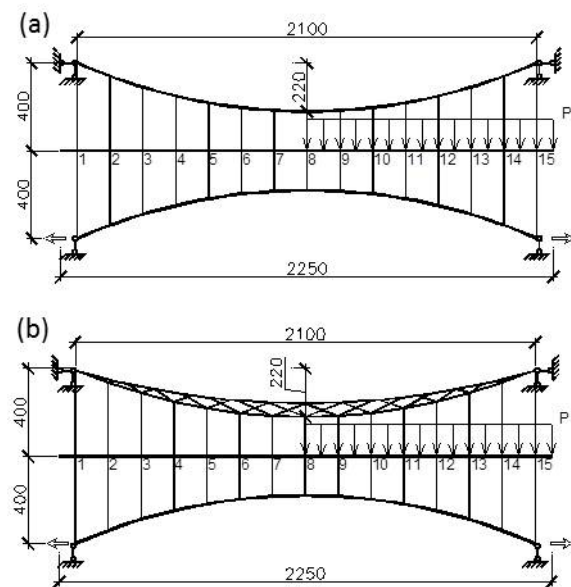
Schemes of the physical models of prestressed suspension bridges. (a) – scheme of the model with single cable; (b) – scheme of the model with cable truss
